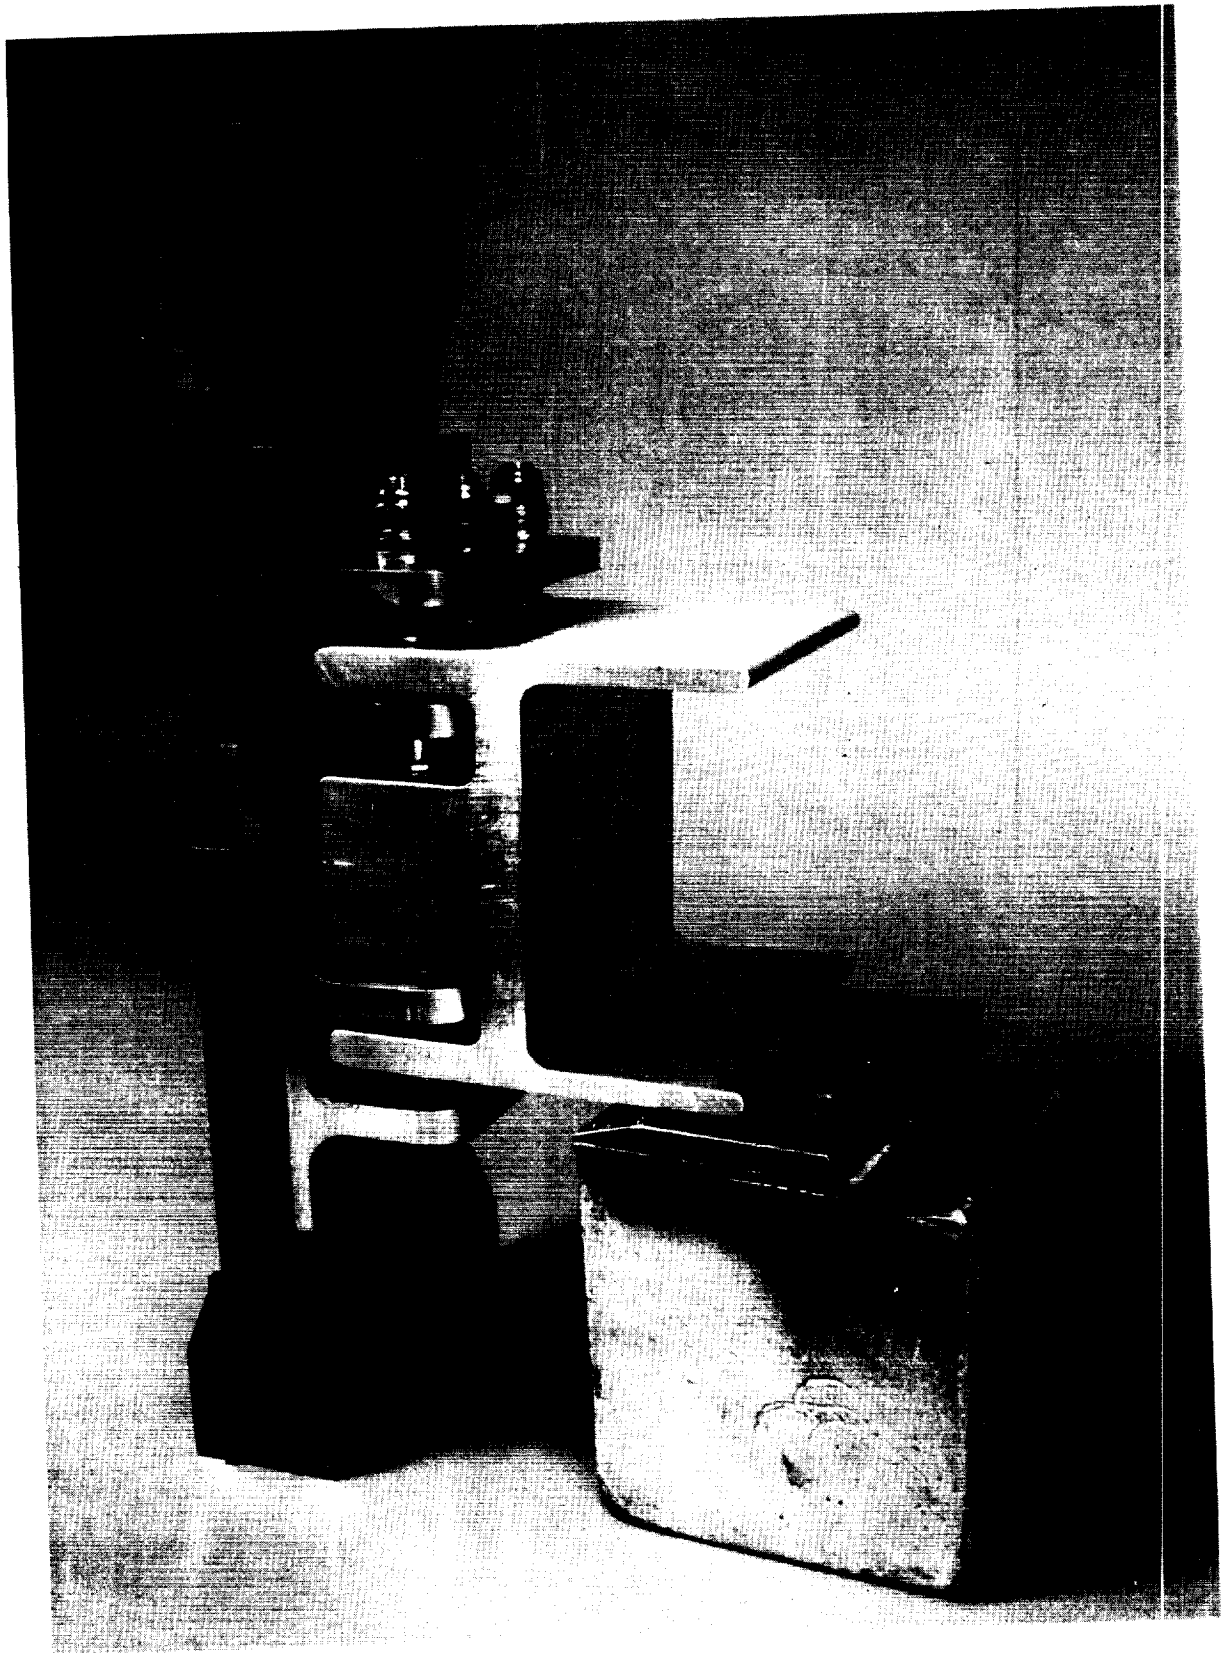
SLIDING JOINT SMALL TEST PANEL — THREE-QUARTER VIEW OF COMPOSITE SIDE
